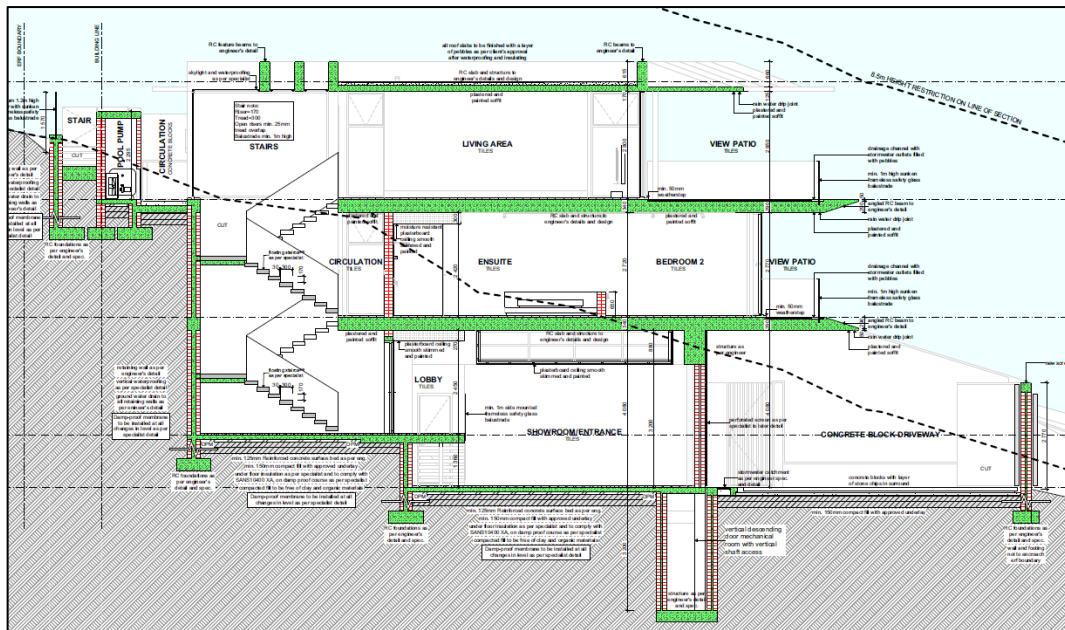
SECTION OF THE PROPOSED DWELLING HOUSE
